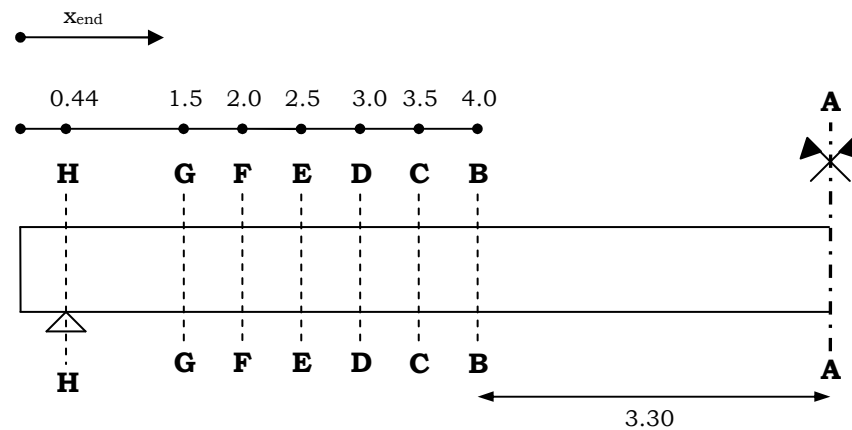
Elevation of the reference beam showing debonding points (in m)
